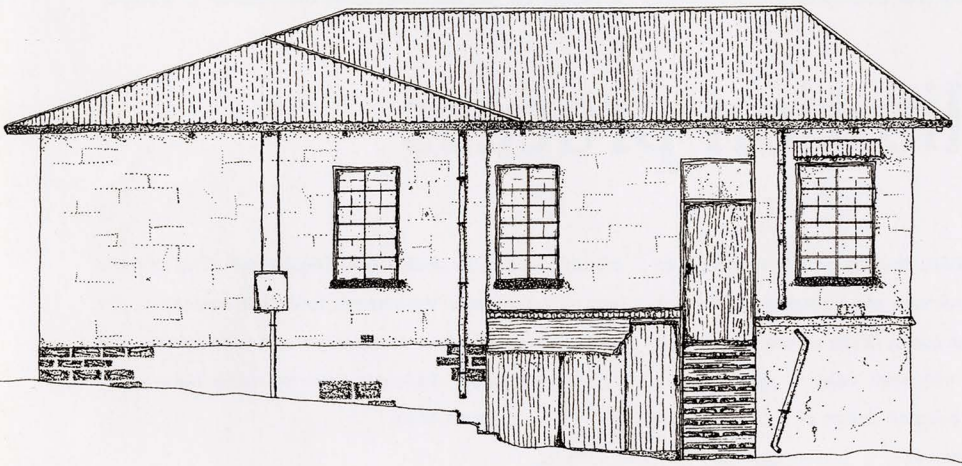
East elevation of house 207 (Brits, Bjornstad, Smit, Terblanch & Te Vaarwerk 2003)
